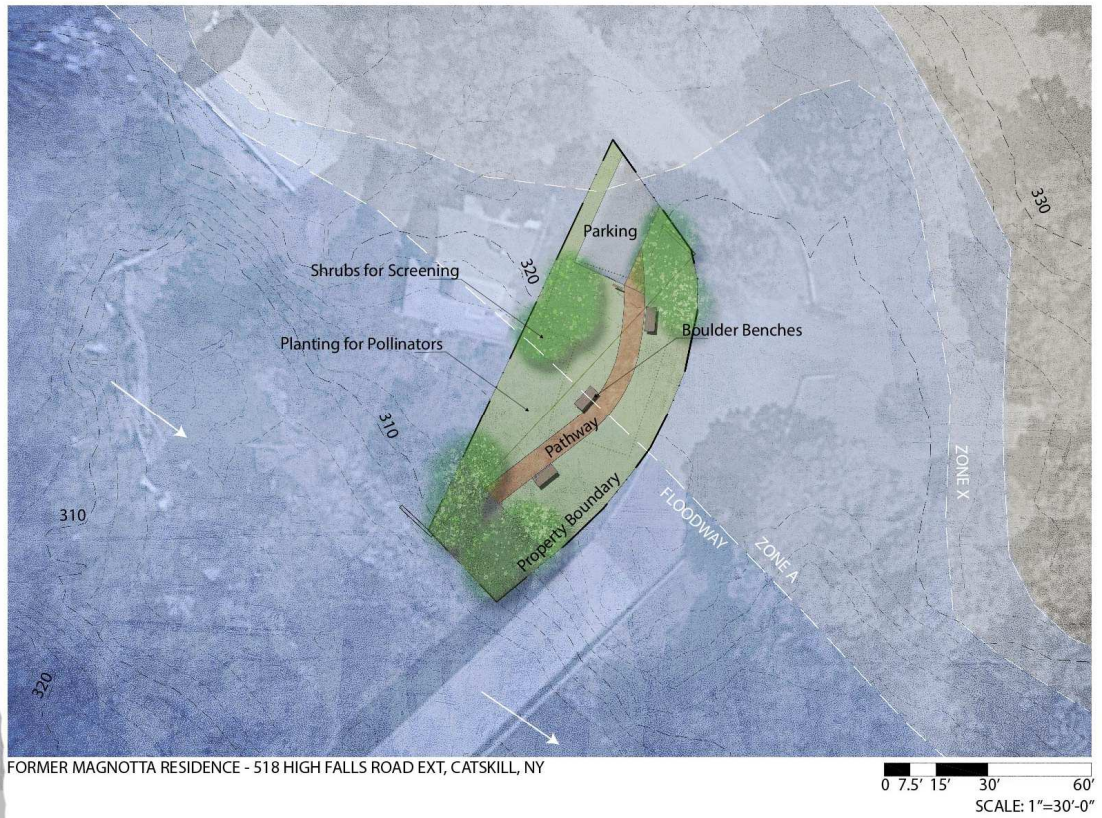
Site Plan of 518 High Falls Road Ext. showing layout and locations of plantings and site amenities.
